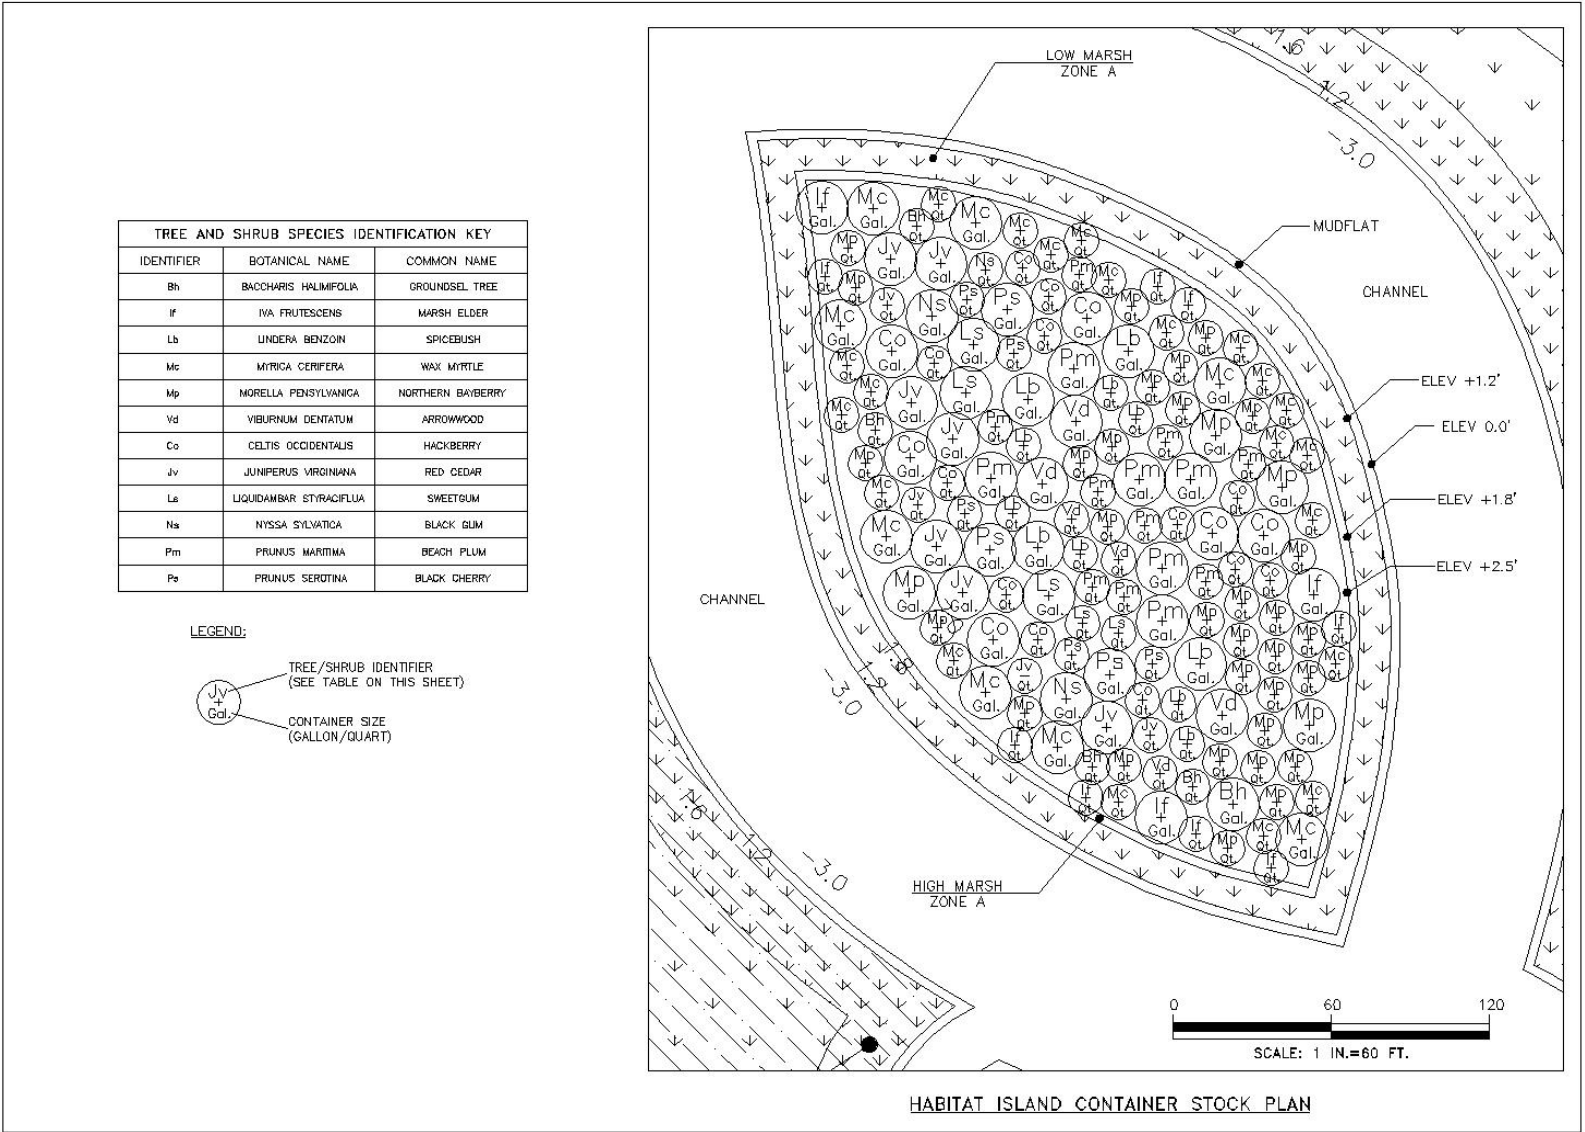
Detailed Cell 3D Proposed Habitat Island Planting Plan
